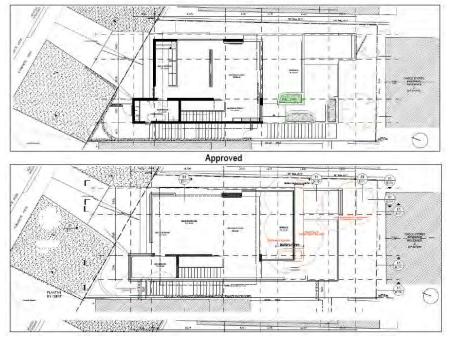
Comparison Plans between the Approved and Proposed Development at Second Floor Level (Source: GSA Statement of Environmental Effects)
